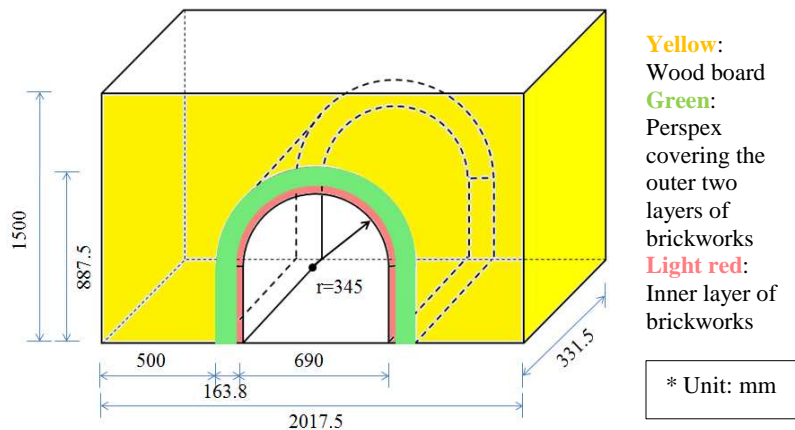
The rigid box surrounding the brick-lined tunnel (Chen, 2014, Chen et al, 2013)
